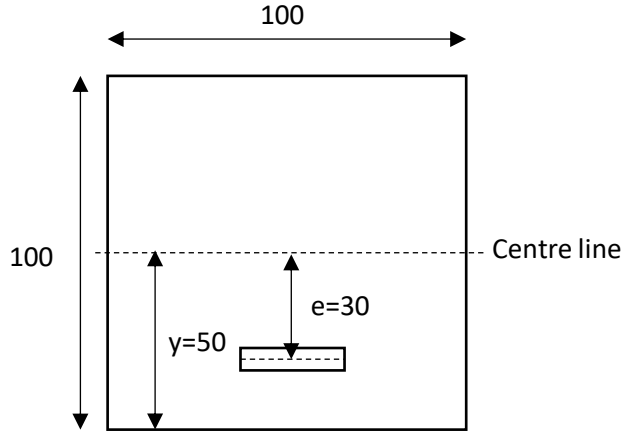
Cross-section of the PET strip test samples (dimensions in mm).
